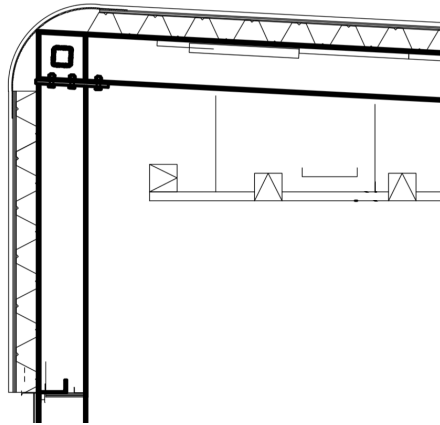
The joint connecting the stairwells to the edge floor beam [7].
